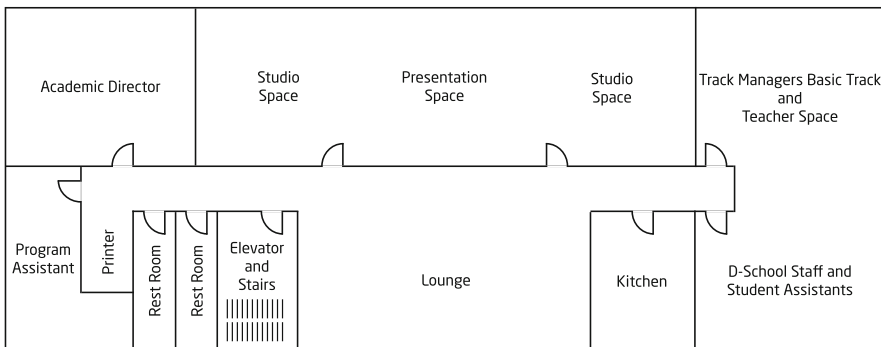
Floor plan, 1st floor, HPI D-School Potsdam (schematic)
